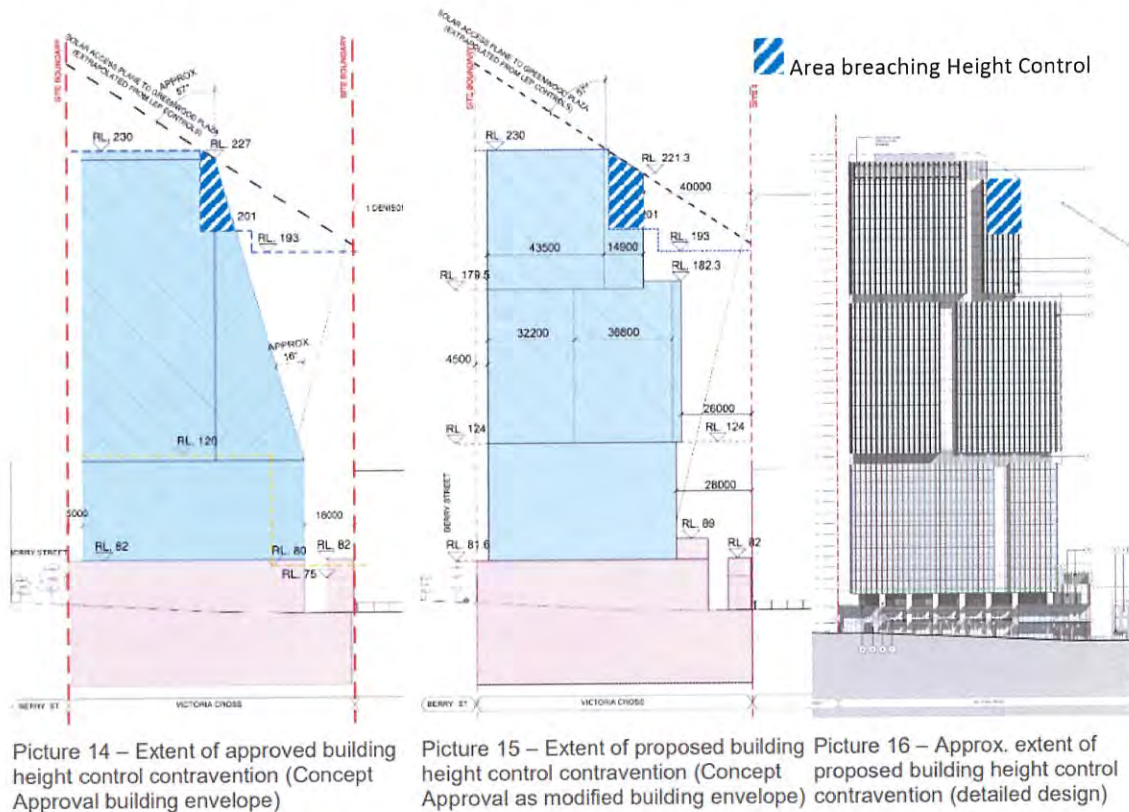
| Approved building envelope (left), proposed building envelope (middle) and proposed west elevation (right) (Source: EIS)
